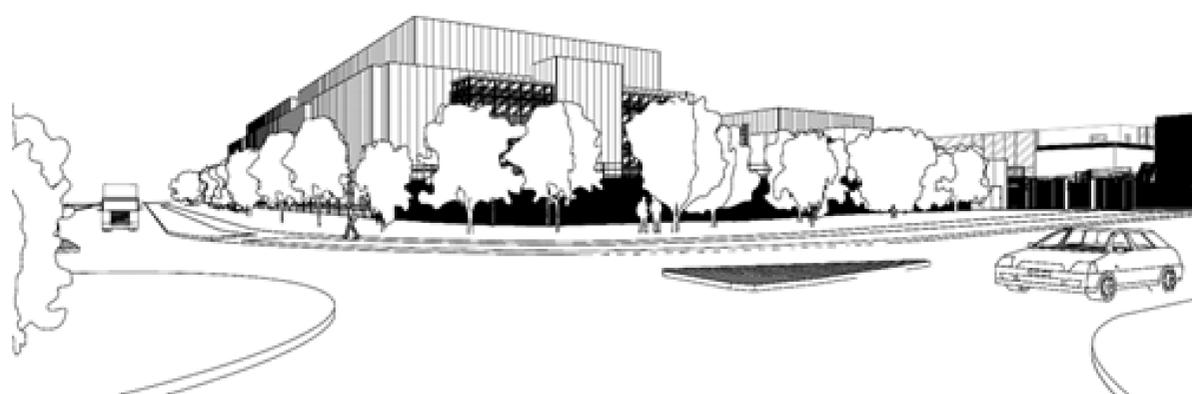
3D Sketch of illustrative design (view 1): Source: studioNWA Architects
